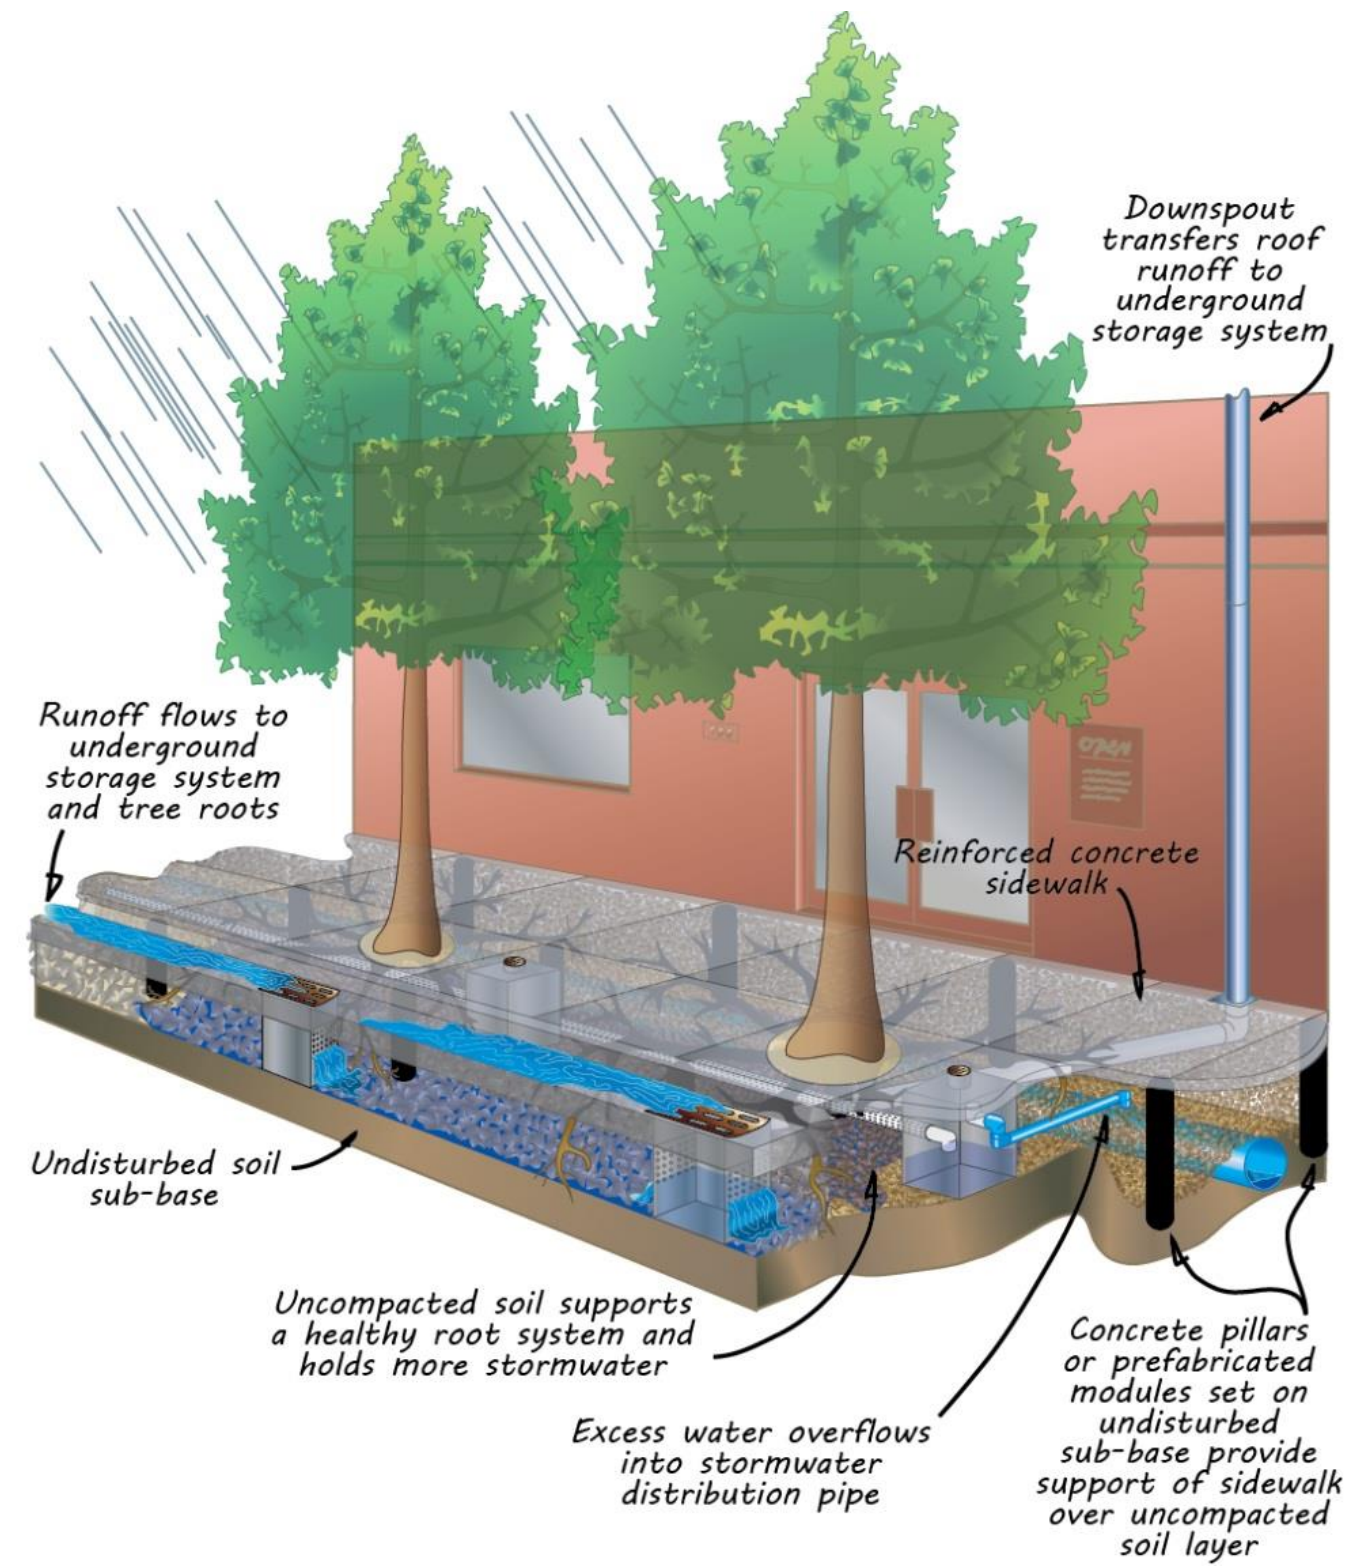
Suspended sidewalks use pillars or structured cell systems to support reinforced concrete, increasing the volume of uncompact soil in subsurface planting areas and enhancing both root growth and stormwater storage.
